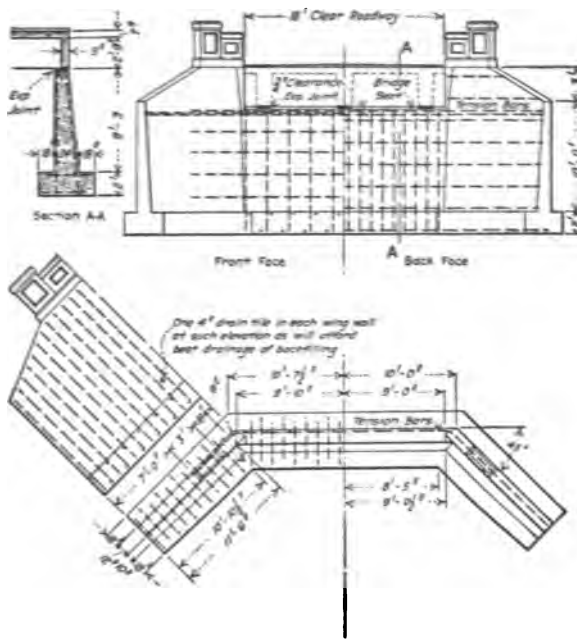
Typical substructure for slab and girder bridges, Iowa Highway Commission.
